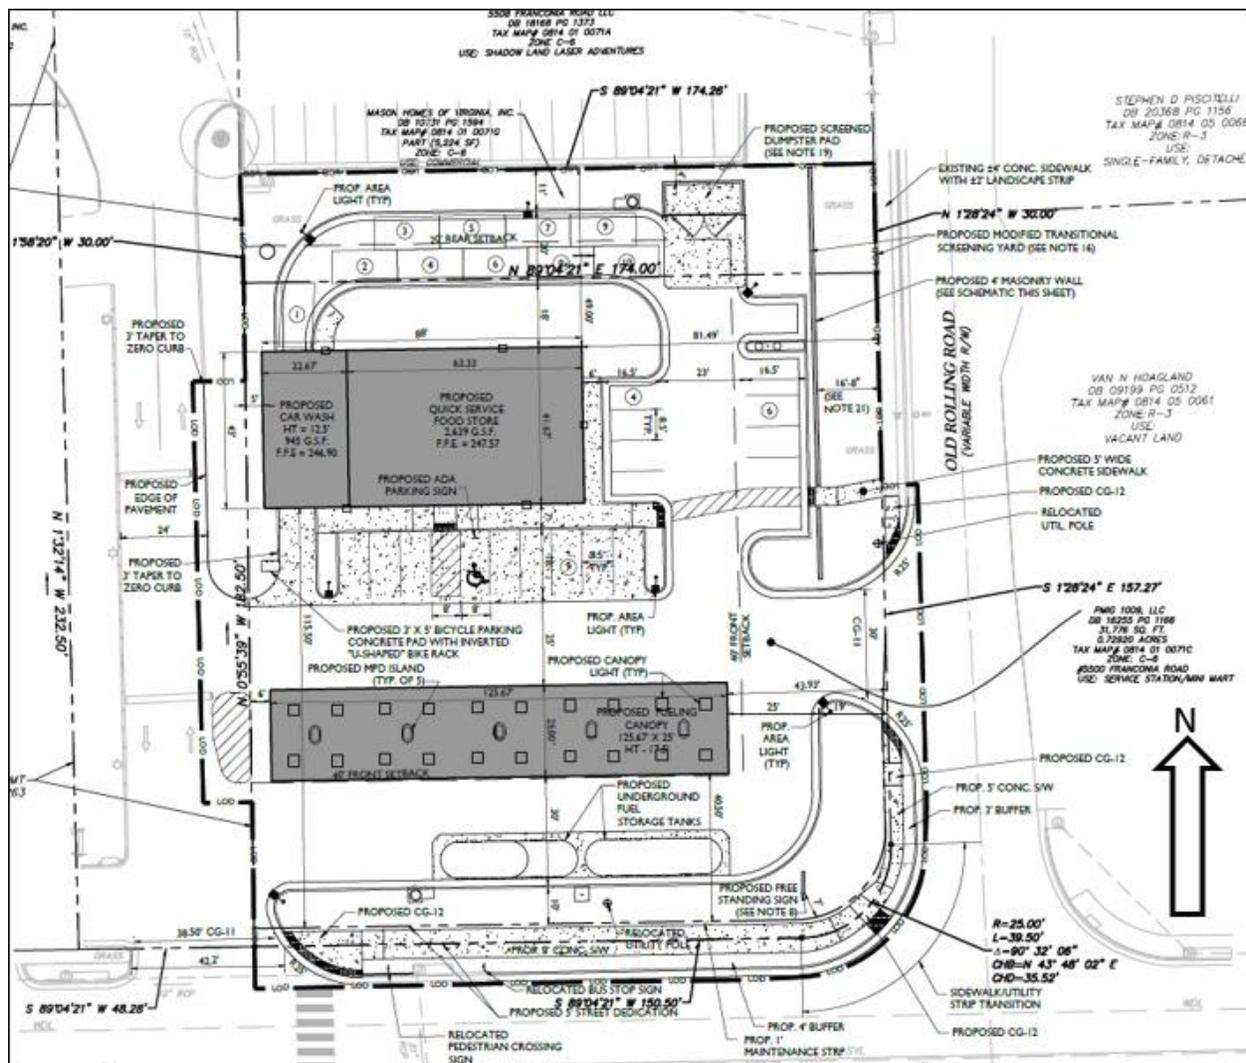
Site Layout (Source: SEA Plat, Sheet C3)
